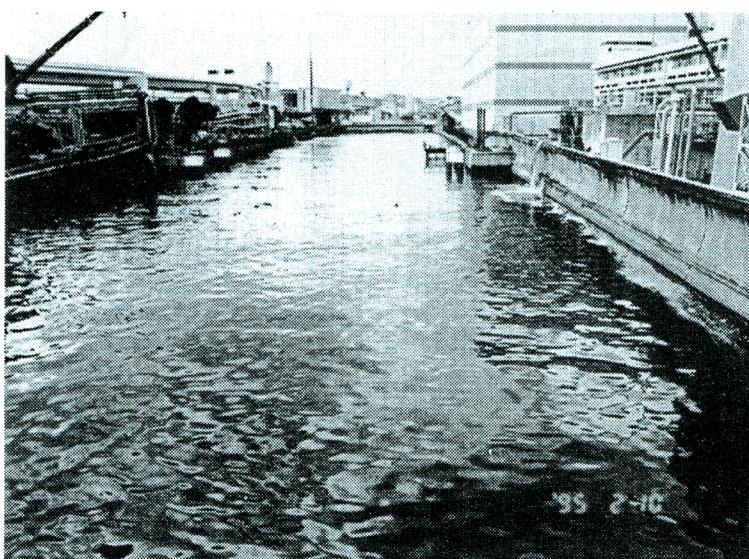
A canal was closed for use as a temporary sewage treatment chamber.
